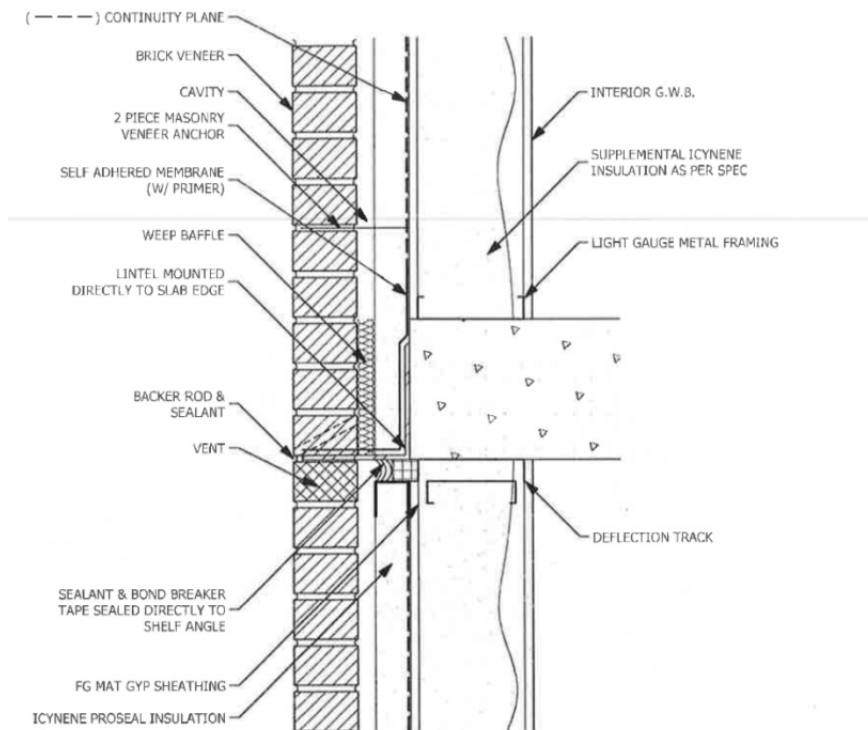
Example of a ProSeal Installation Manual detail that outlines the components and accessories needed to maintain continuity across the floor plate and to provide for movement of the concrete floor slab
